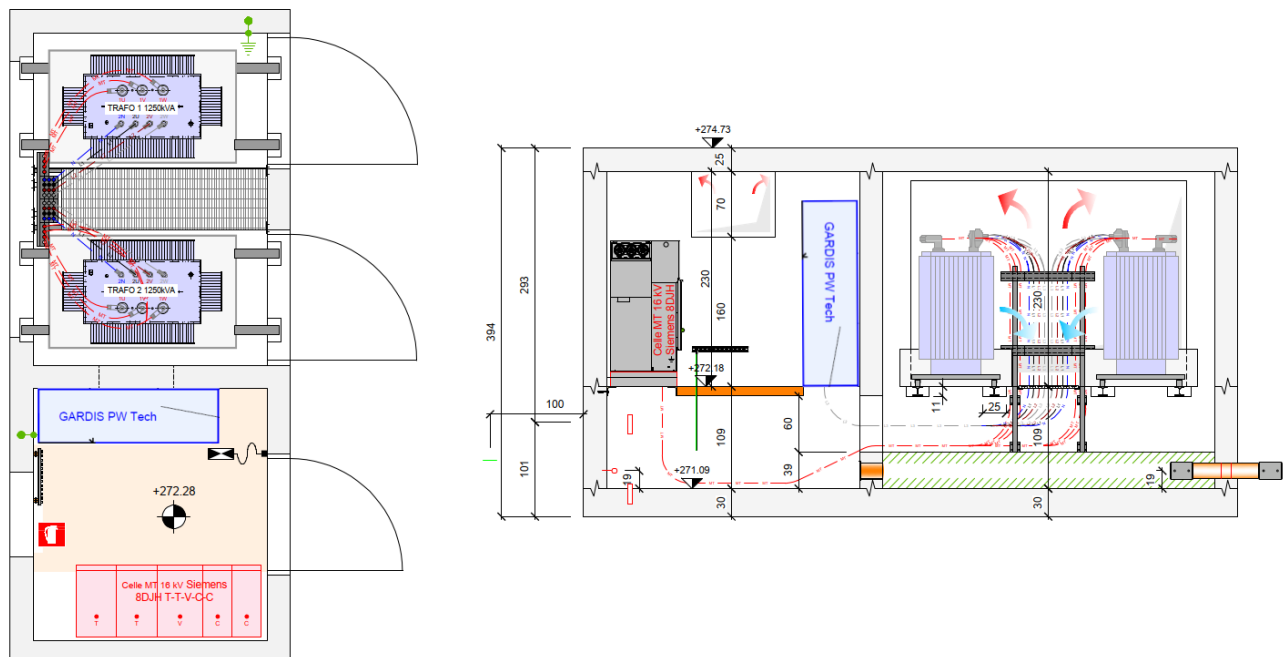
AIL transformer cabin plan with the new MT and BT switchboards
